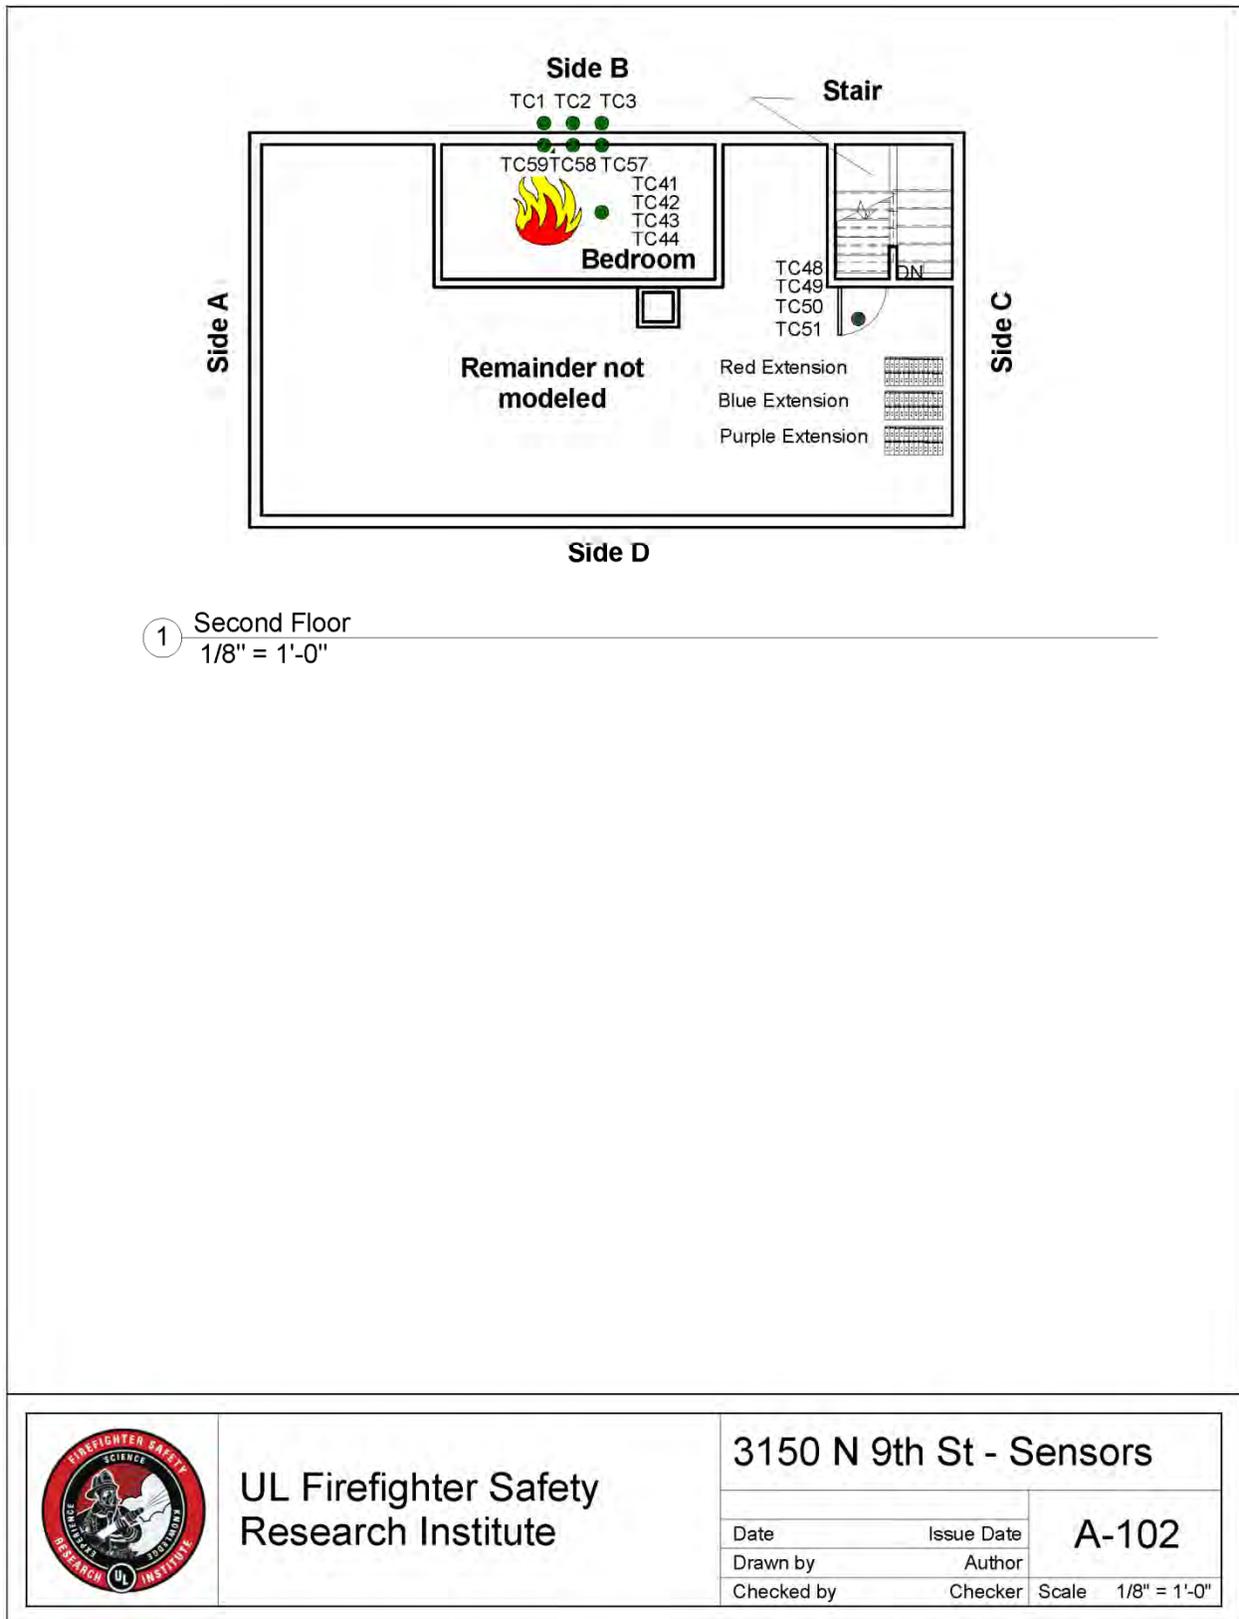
Field Experiment 1 - 3150 N 9th Street 2nd Floor Sensors
